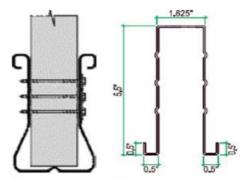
TrusSteel® Dyna Truss Chord and Nuconsteel NUTRUSS® Source: Reference [13][28].
